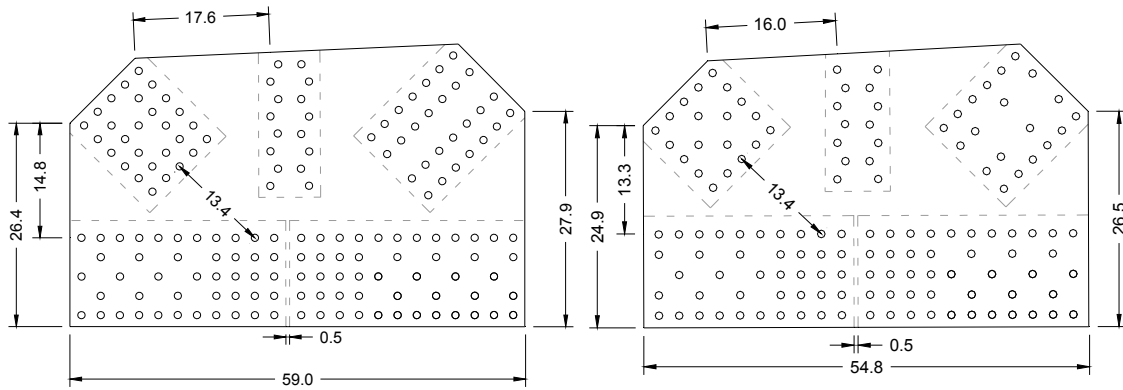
Dimensions in inches for SS3 specimens. (left) GP307SS3. (right) GP490SS3.
